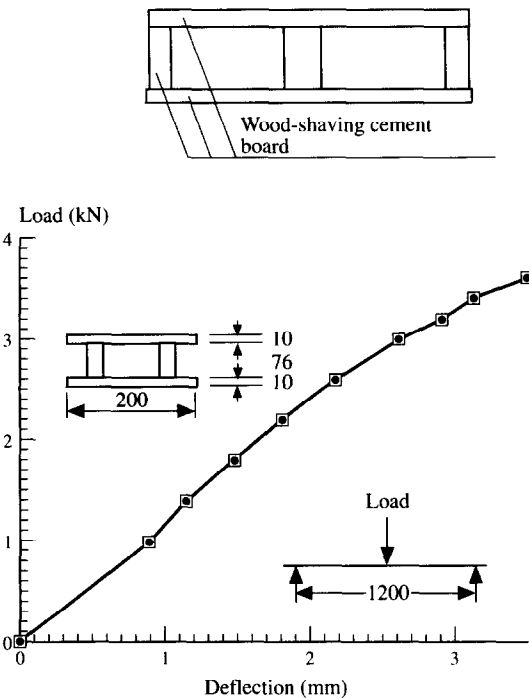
(Top) conventional cross-section of wood shaving-cement board roof panel; (bottom) a typical load-deflection curve of plain wood shaving-cement flexural member tested by the author.
